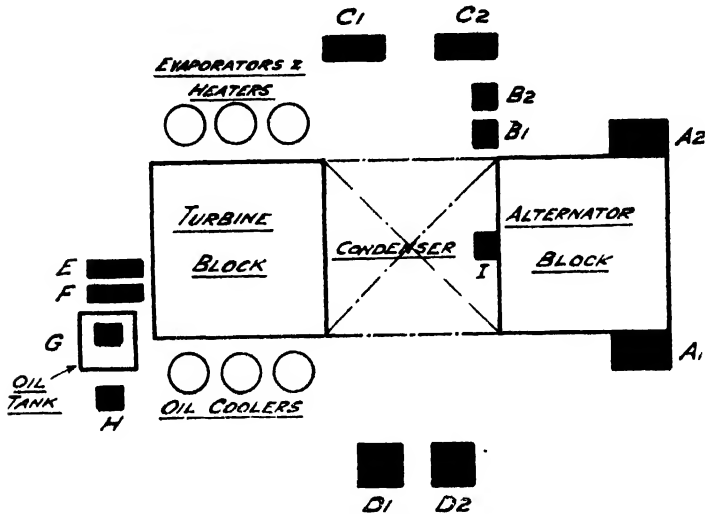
Layout of Turbo-Alternator Auxiliary Plant.
